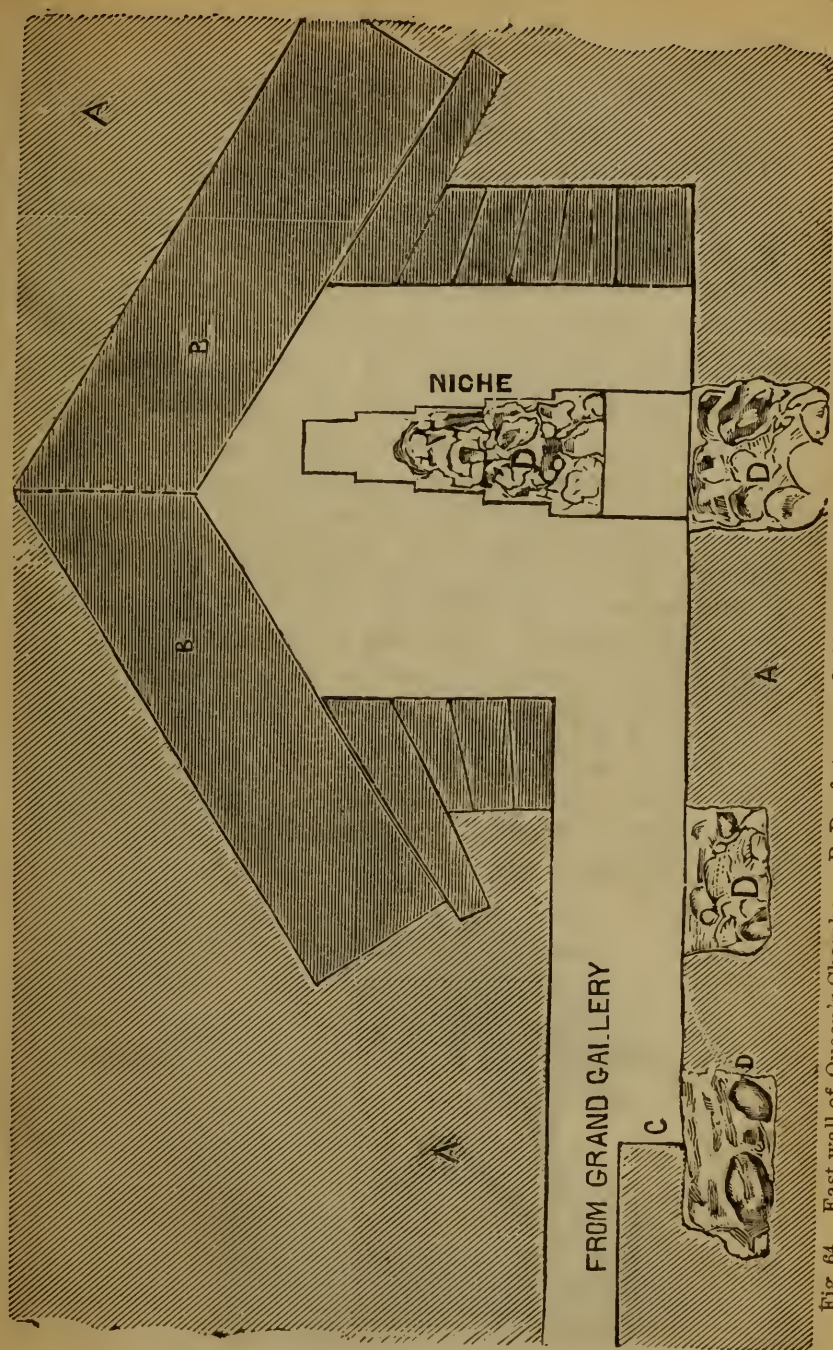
East wall of Queen's Chamber. B, Roof stones. C, 20-inch step. D, Excavations.
